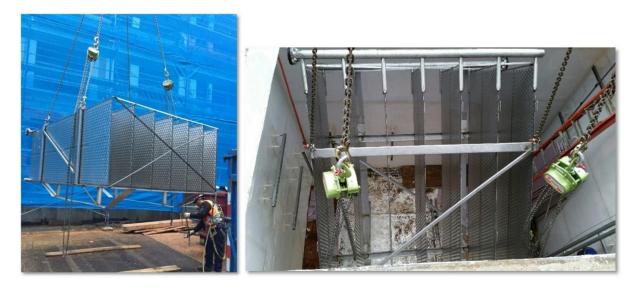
AWEB, SJ-08T Slim Jim Heat Exchangers being lowered into the wastewater vault
